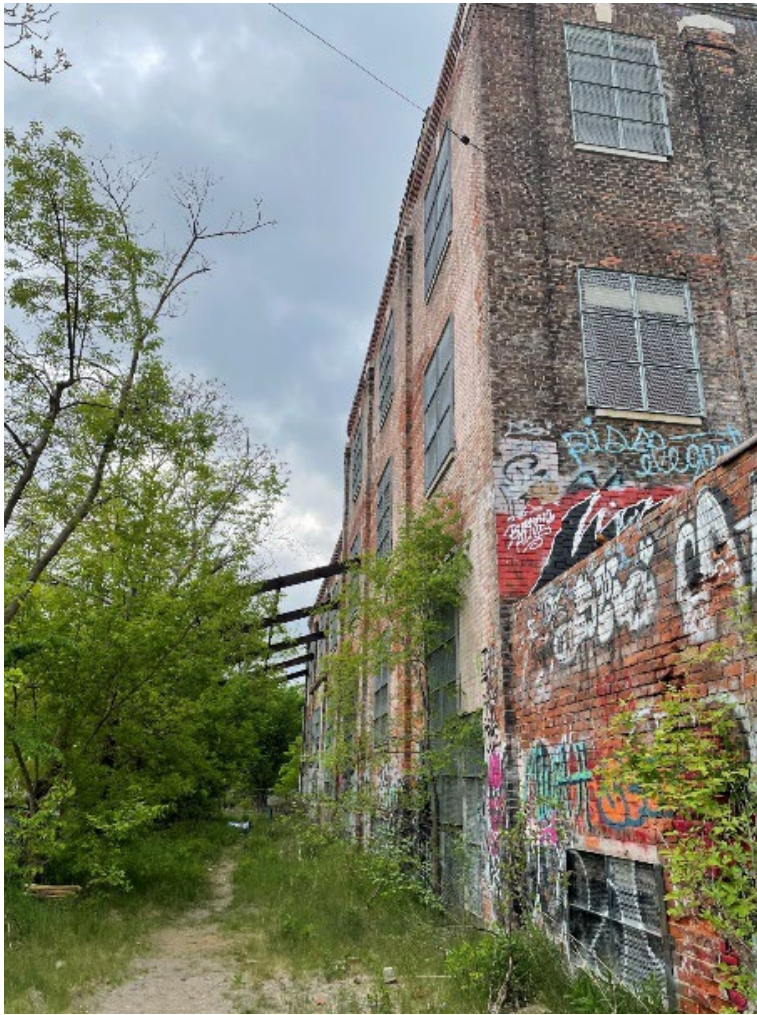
Detail view of the south elevation looking west showing the remnant of the possible pathway the former rail spur took into the steel canopy docking station (Heritage Planning, 2025).
